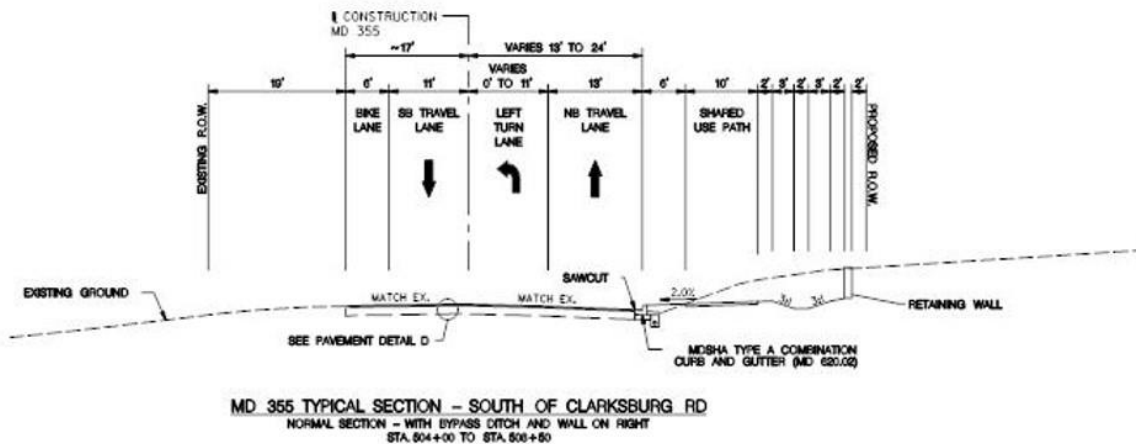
Frederick Road - South of Clarksburg Road Cross Section
